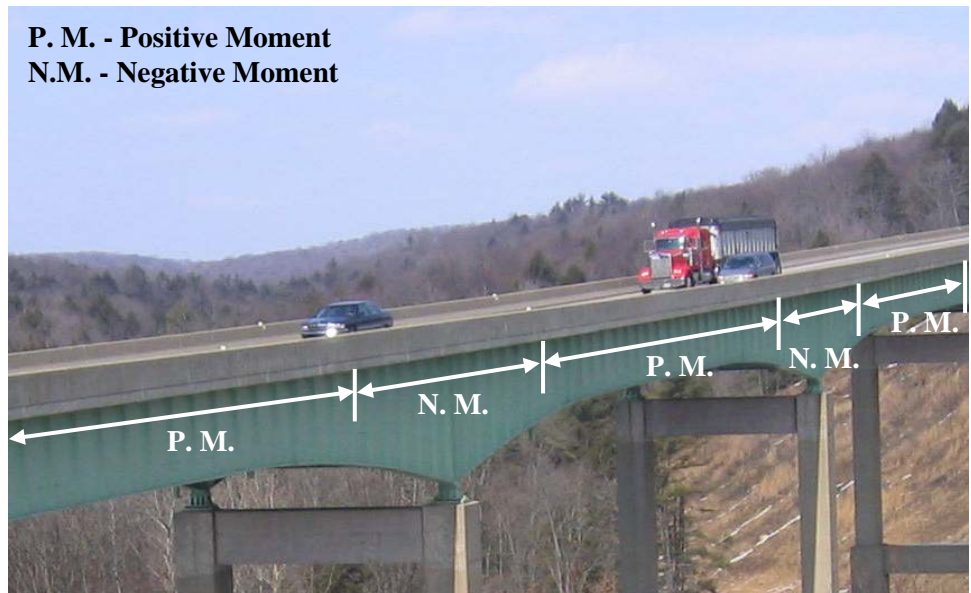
Flexural Zone on a Fabricated Continuous Span Multi-Girder Bridge
